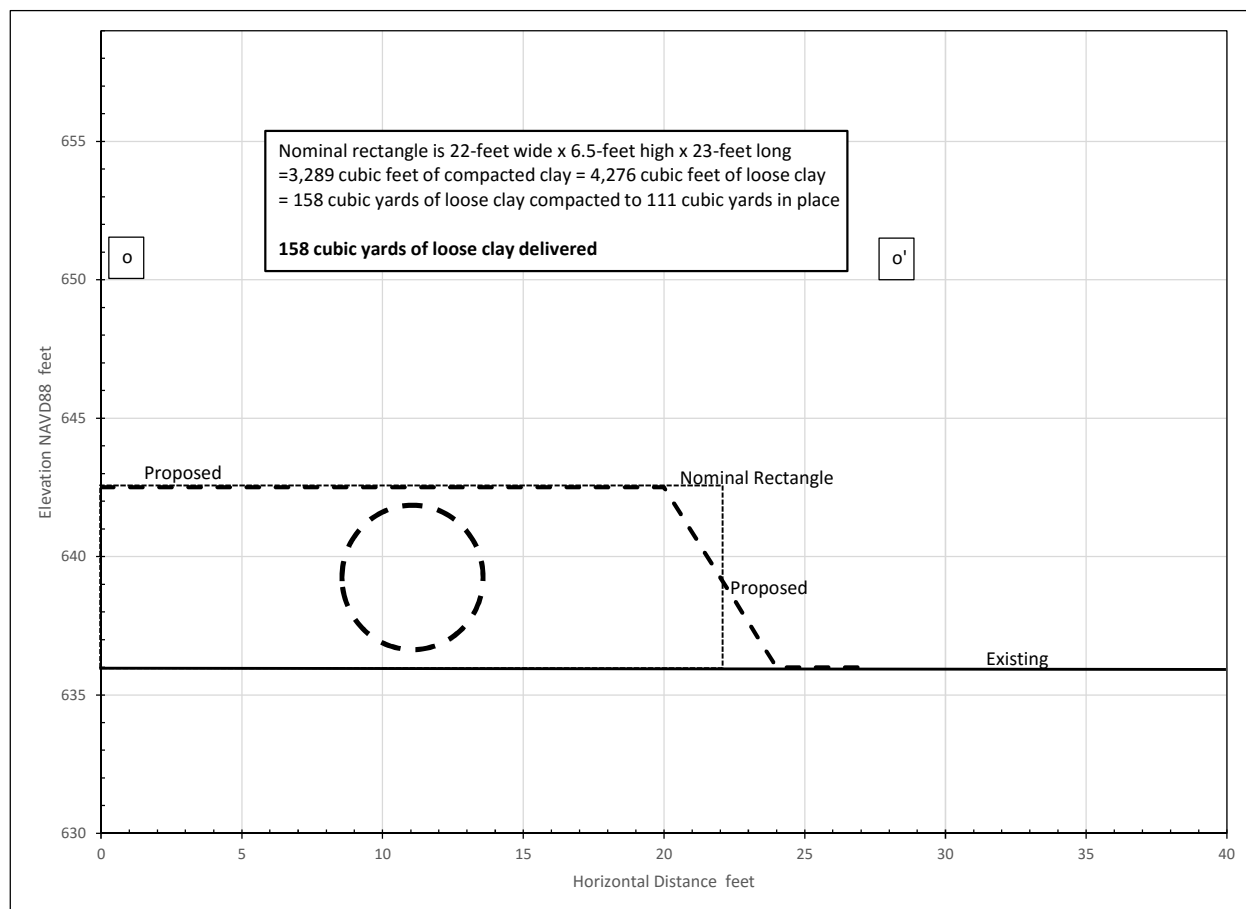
Cross section o-o' showing the clay block at the entrance to the culvert under Bridge Street.
